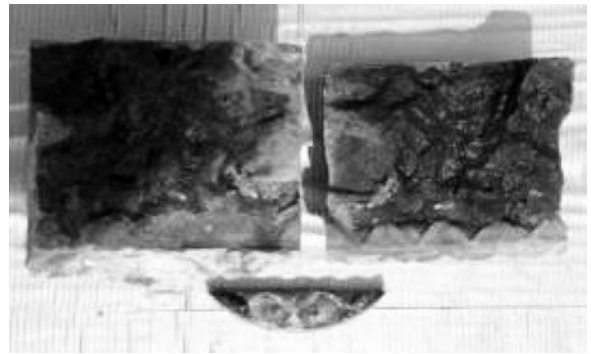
(c)—Faces of crack in core from a concrete deck.
